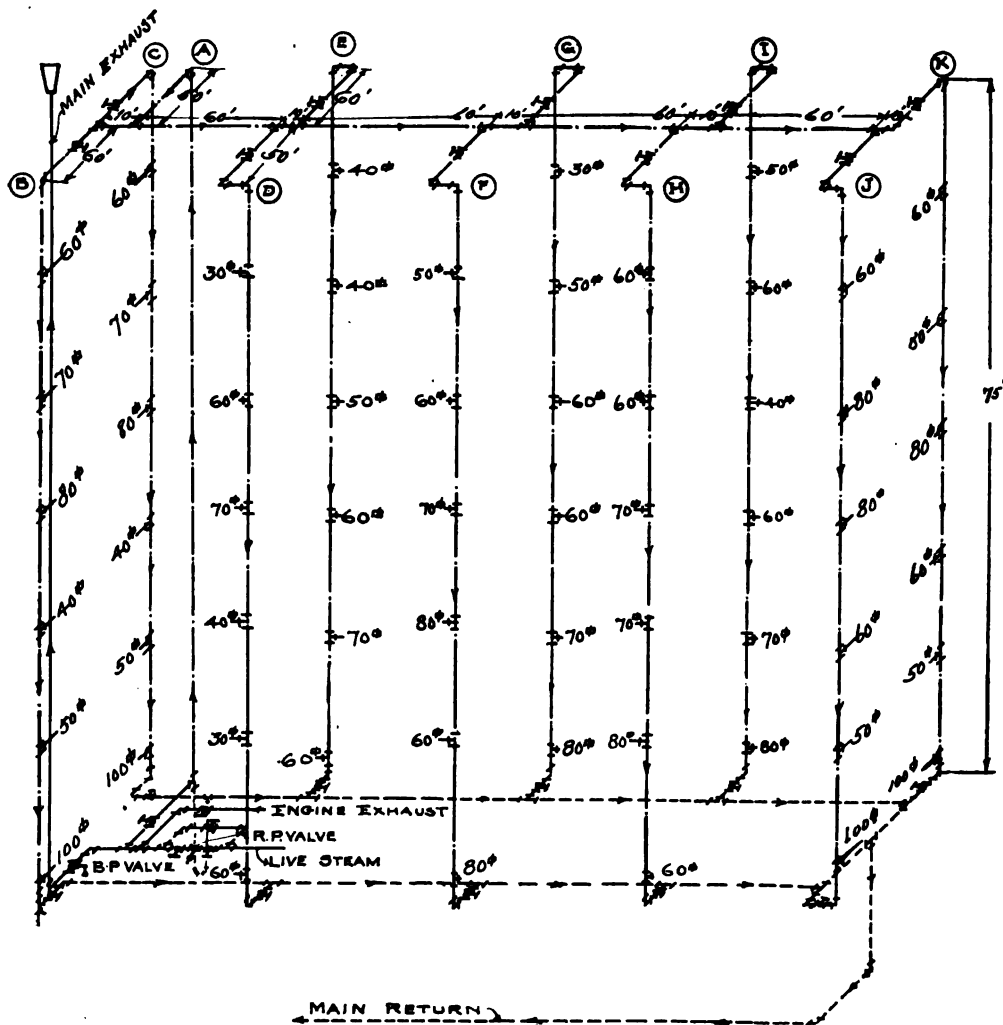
SKETCH SHOWING ARRANGEMENT OF MILLS SYSTEM OF HEATING.
